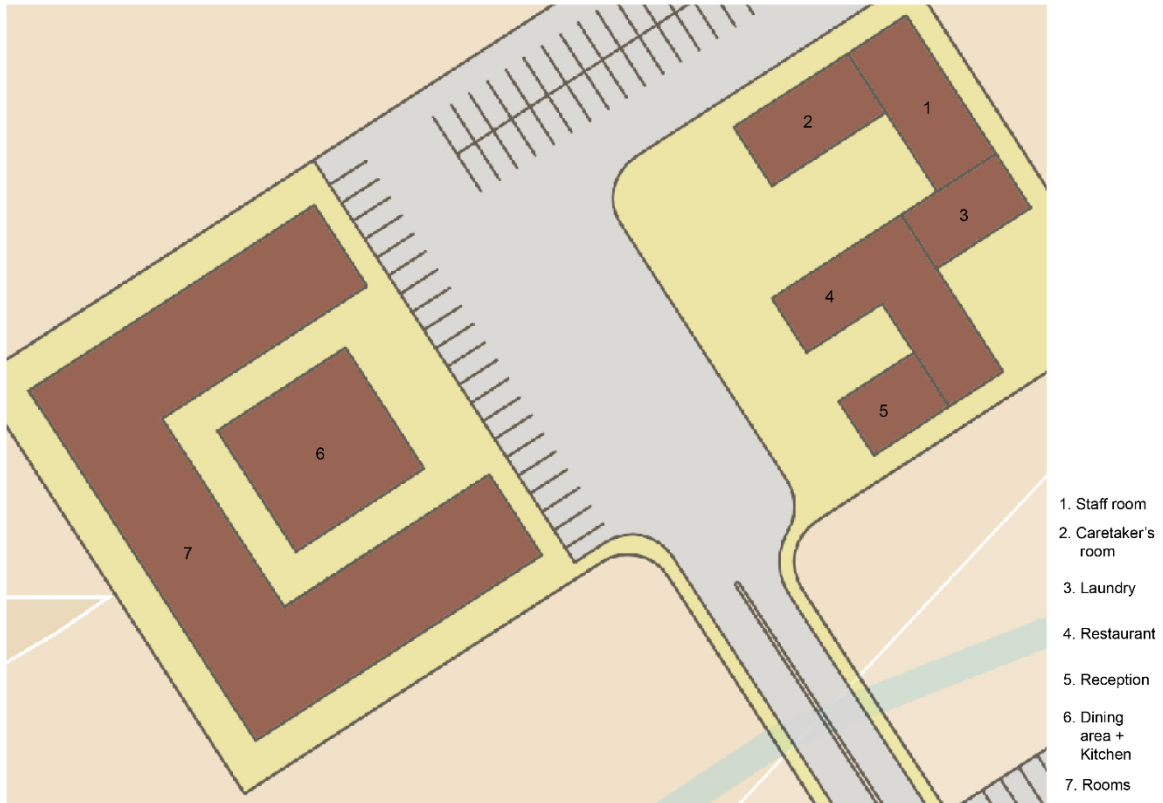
Staff accommodation and Tourist lodging facility, (Author)
